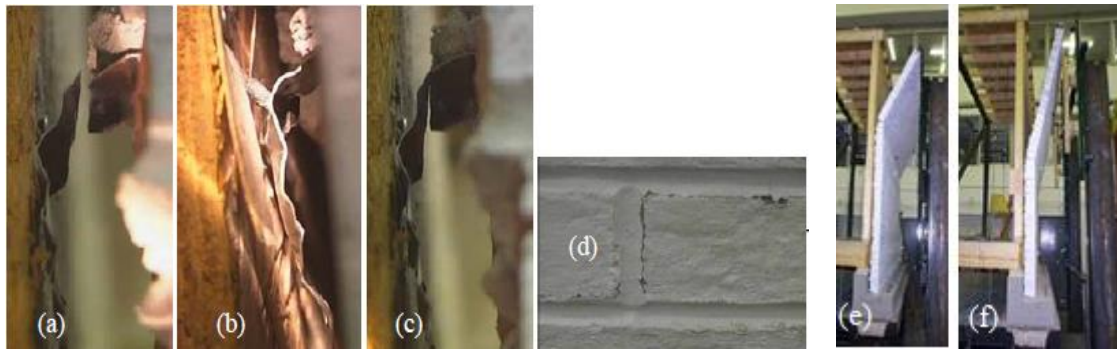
Veneer wall damage: (a) tie fracture; (b) nail pull-out; (c) partial tie fracture; (d) cracks in the brick veneer bed and head joints, (e) and (f) wall collapse [14]
